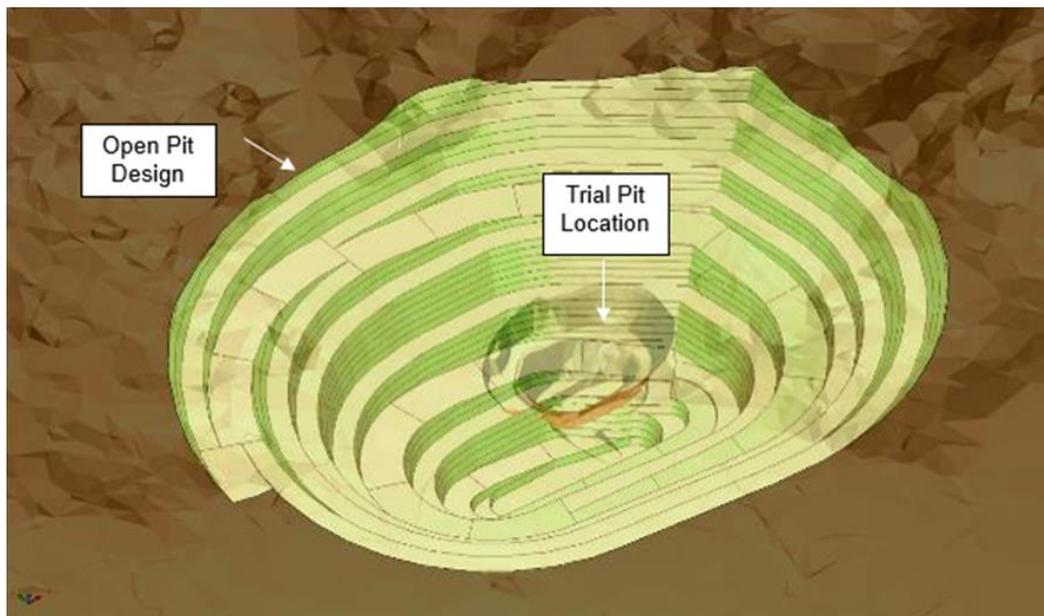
Proposed Wolverine Open Pit Design Isometric View
